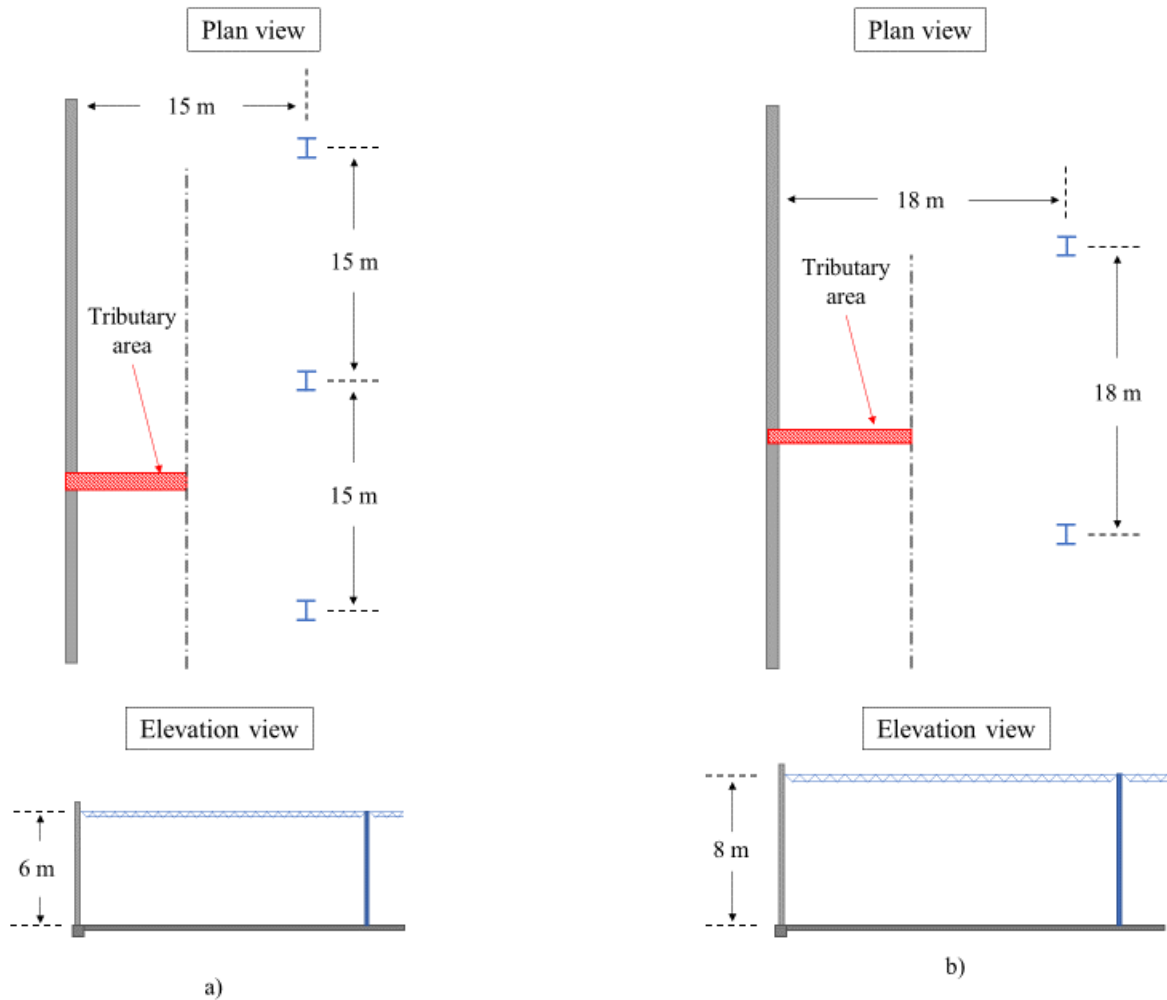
Typical layout and tributary area (1 m strip) supported by warehouse walls: a) 6 m tall warehouse; and b) 8 m tall warehouse
